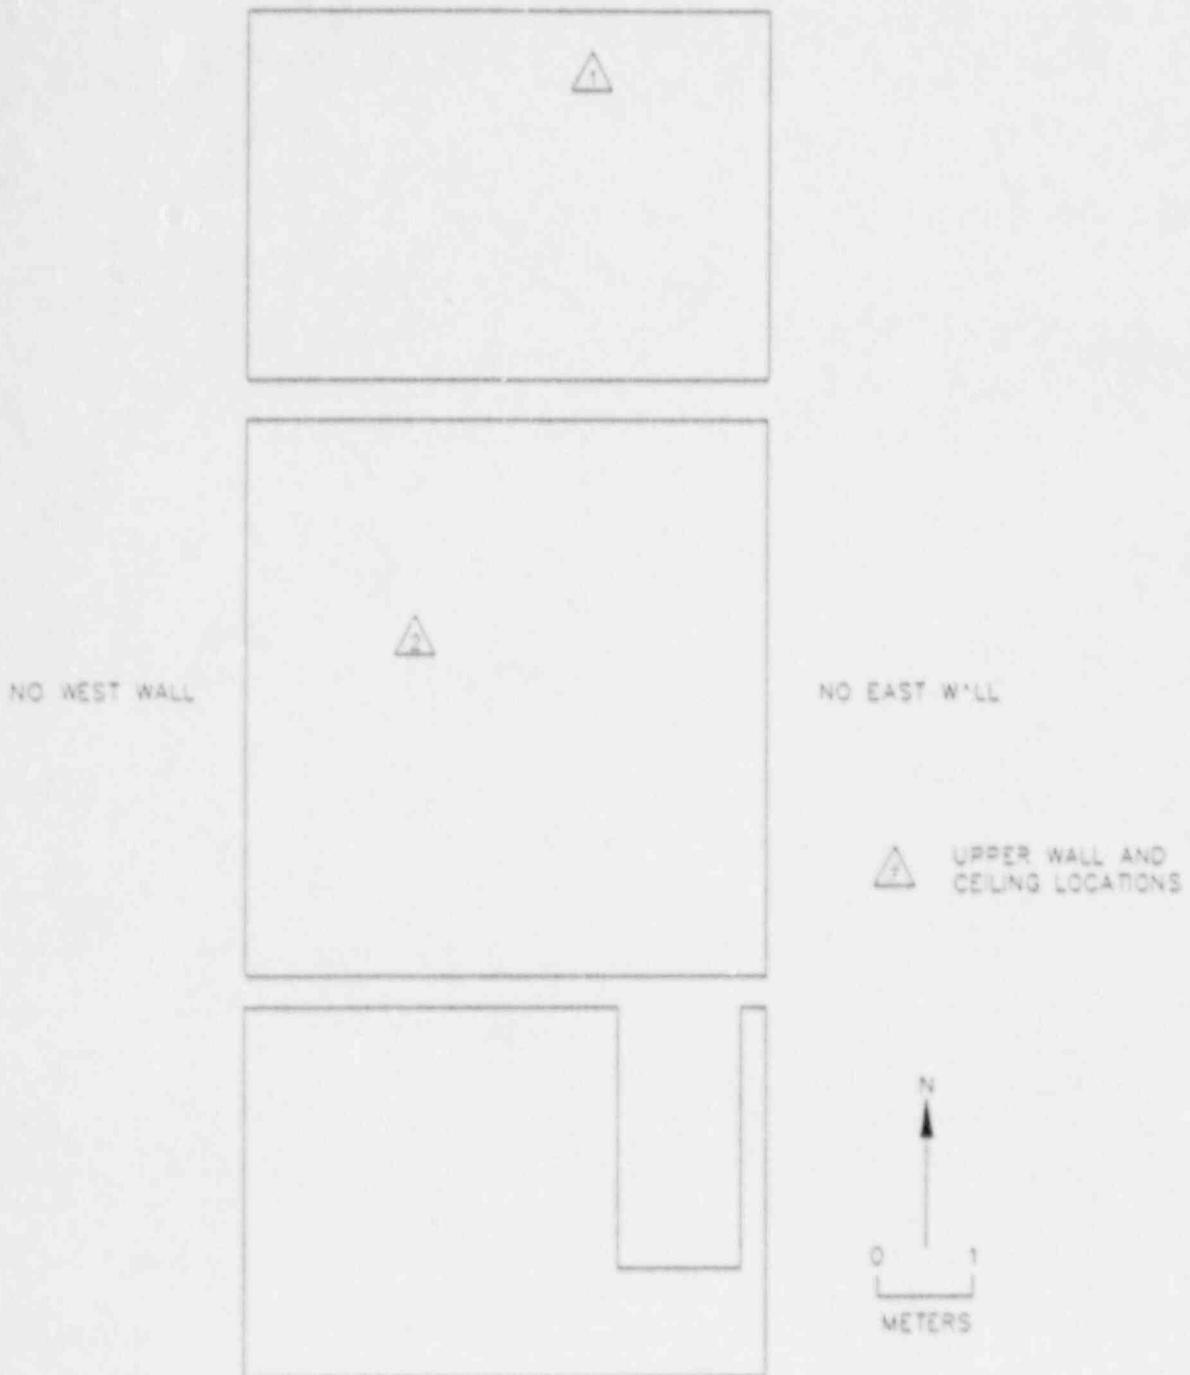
Room 3 Showing Locations of Upper Wall and Ceiling Single-point Measurements
